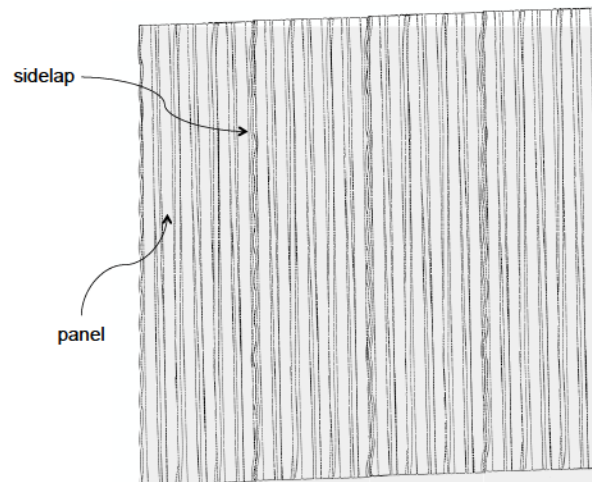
Undeformed shape of shell FE model (fastener layout: 36/4-6)
